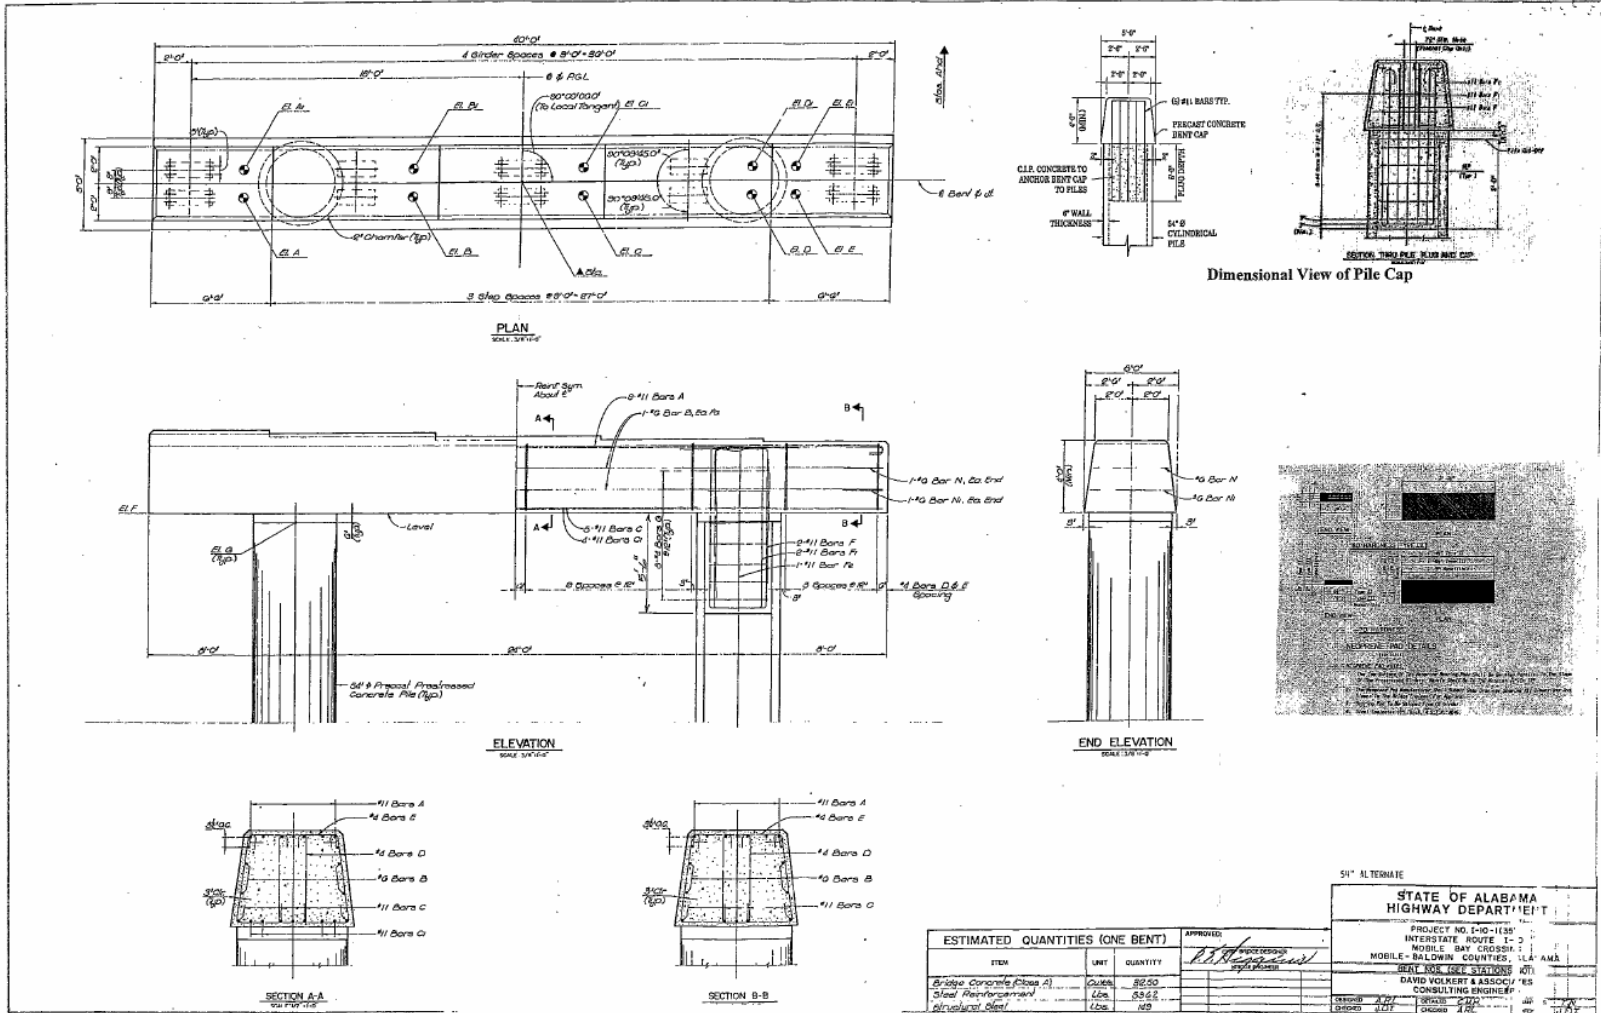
Substructure Plan and Elevation of I-10 Bridge
